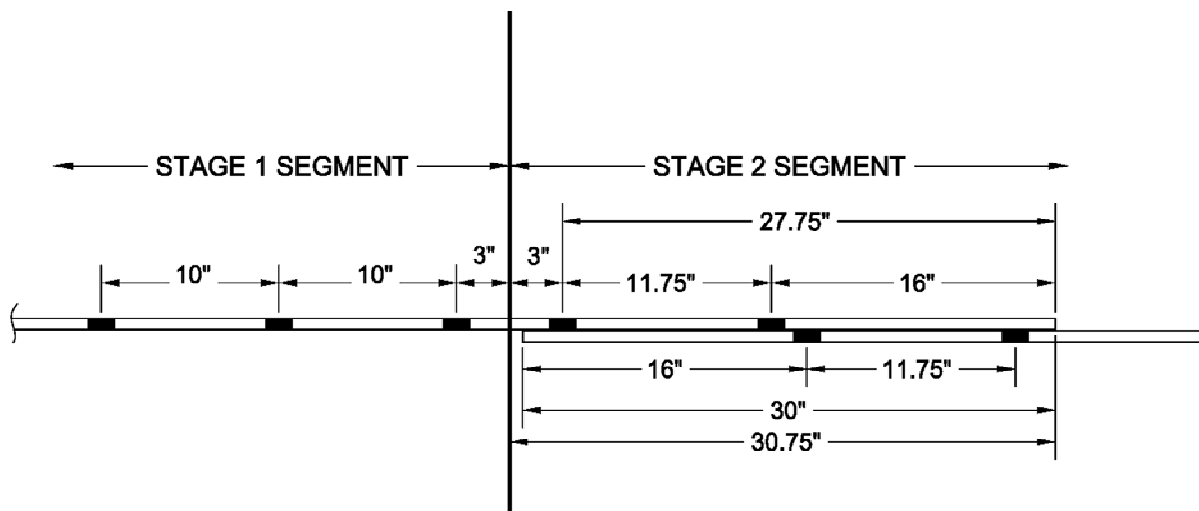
Strain gauge locations within splice of longitudinal reinforcement
